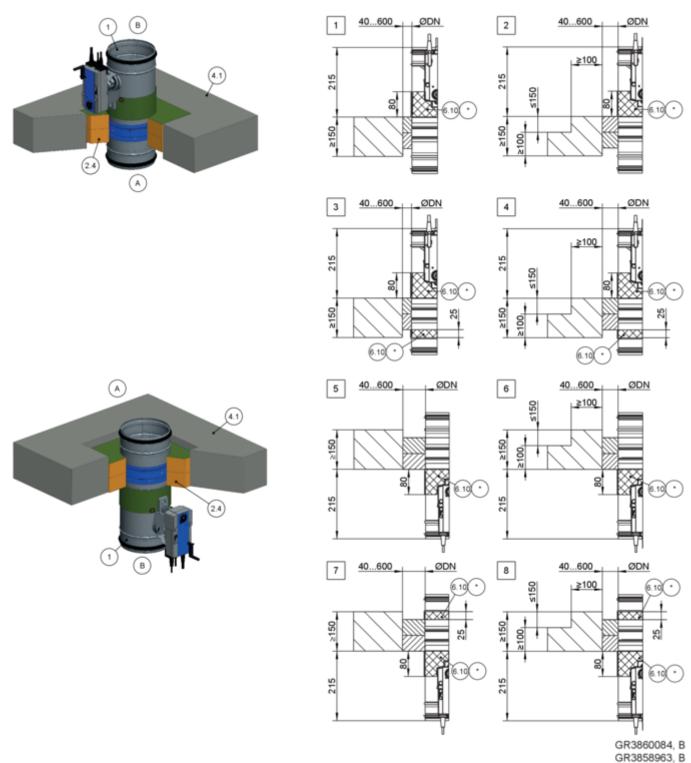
Dry mortarless installation into a solid ceiling slab, with a fire batt, upright and suspended
